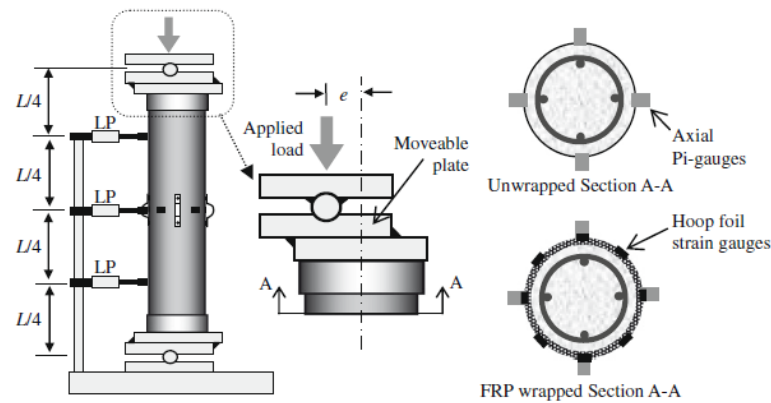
Instrumentation and experimental set-up for column specimens (Bisby and Ranger, 2010)
